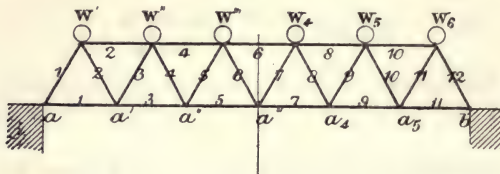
Warren-Girder, uniformly loaded—Longer Flange Undermost.
